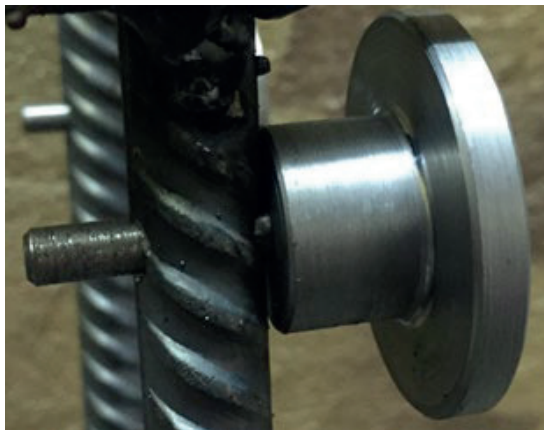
Steel adapter fitting in the longitudinal reinforcement bar
